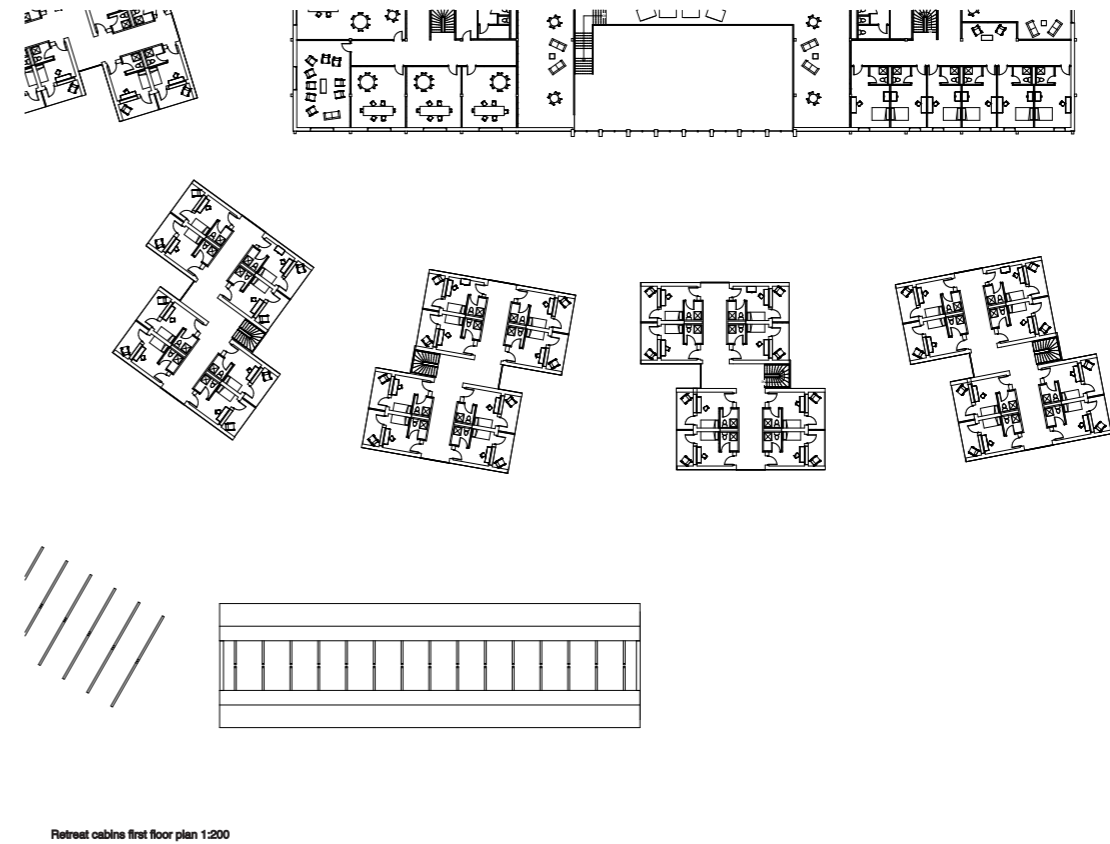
Private retreat cabins first floor plan 1:200 rescaled. Source: Own work, 2026.
